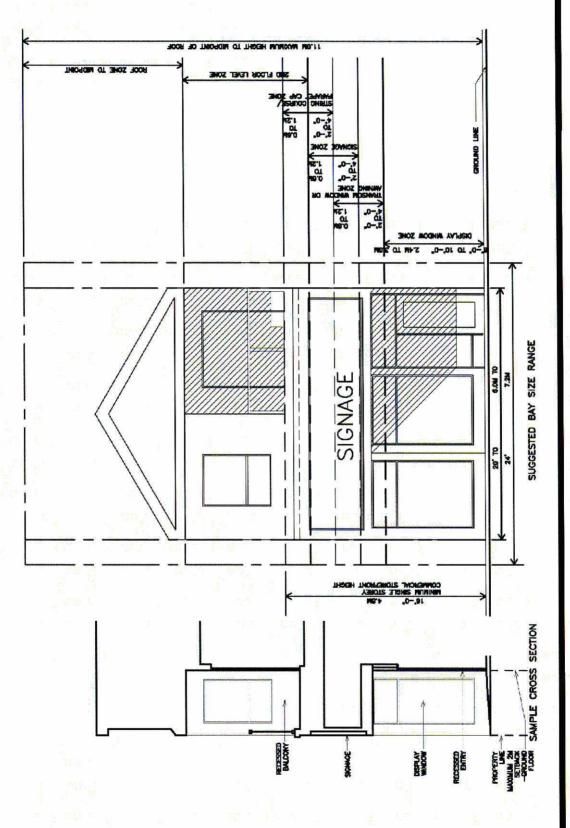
Sample Front Elevation - Two Storey Mixed Use Development
